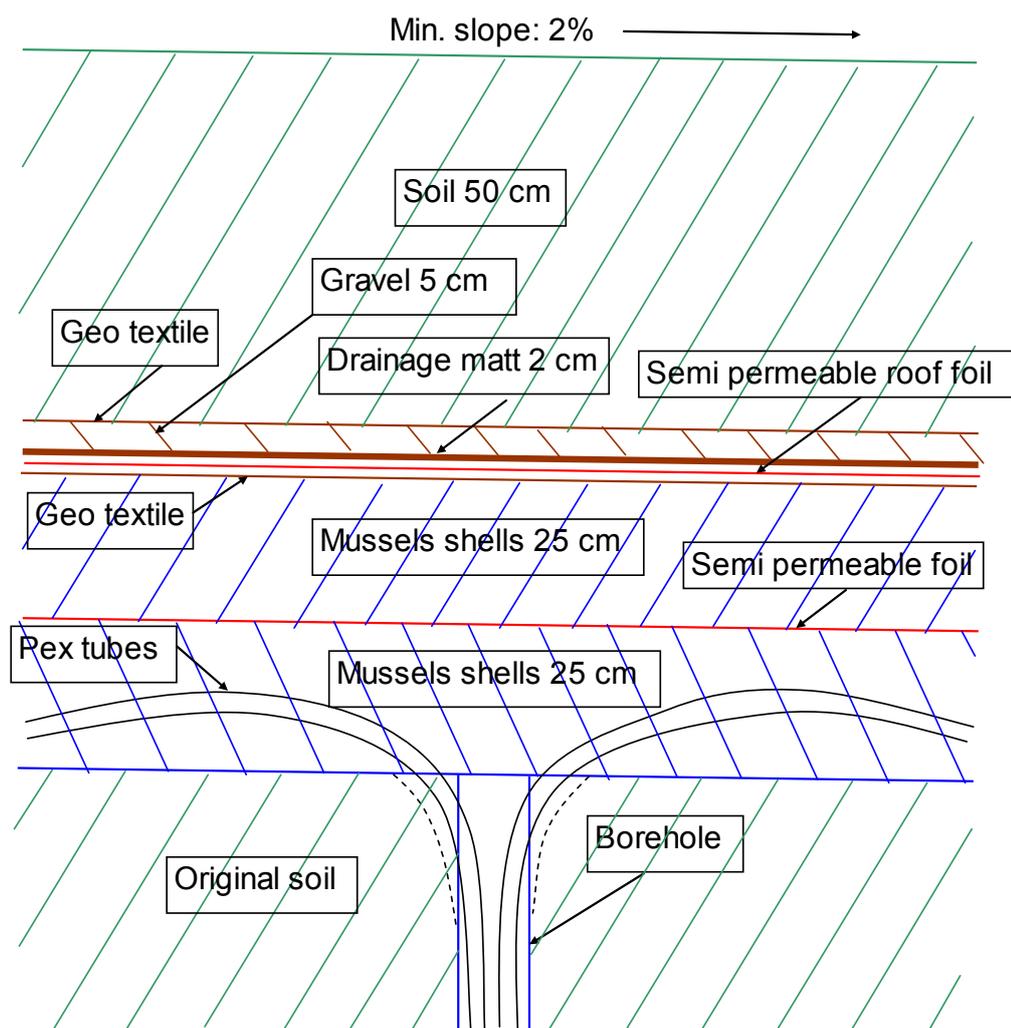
Cross section through the top horizontal layer of the BTES in Bradstrup (source: Planenergi)
